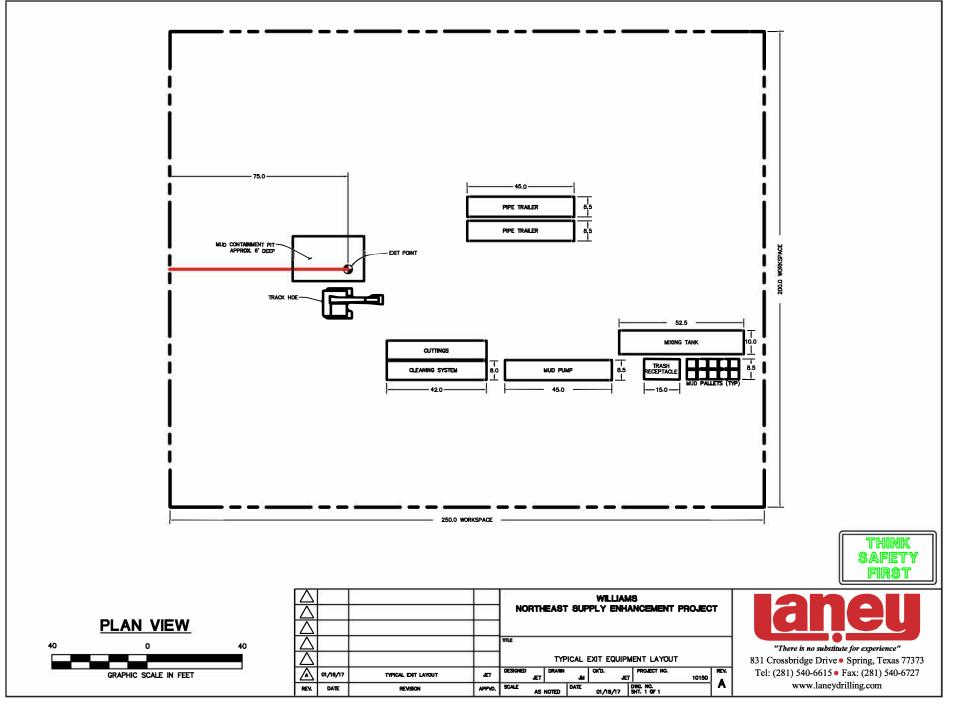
Lockwood Marina Horizontal Directional Drill
